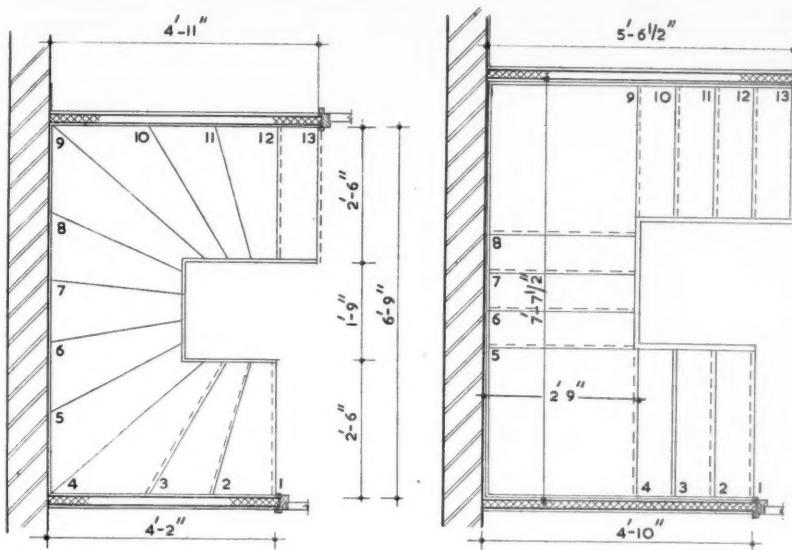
Plan showing the space-saving achieved by the 'constant-going' stair
